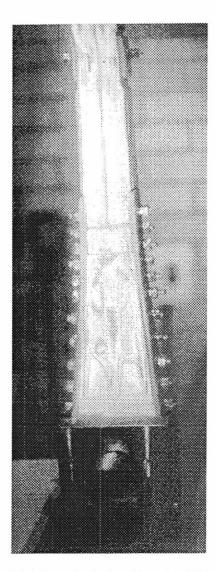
Lug After Fatigue Test: Applied Compressive Load of -100 kN
